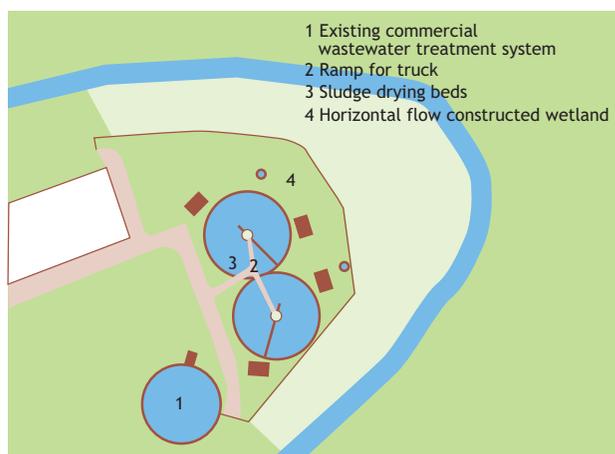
Proposed lay-out for a faecal sludge treatment plant with unplanted sludge drying beds. The beds are laid out in a circular design with one inlet. The leachate is to be treated in horizontal flow constructed wetlands (HPCIDBC, 2011).
